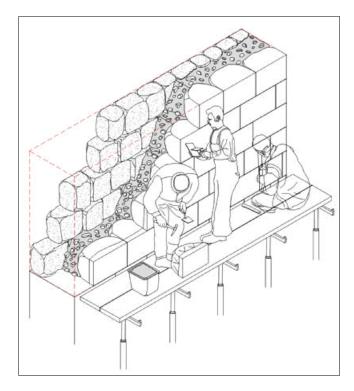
A sketch of a typical masonry wall work (Thierry Grandin)
